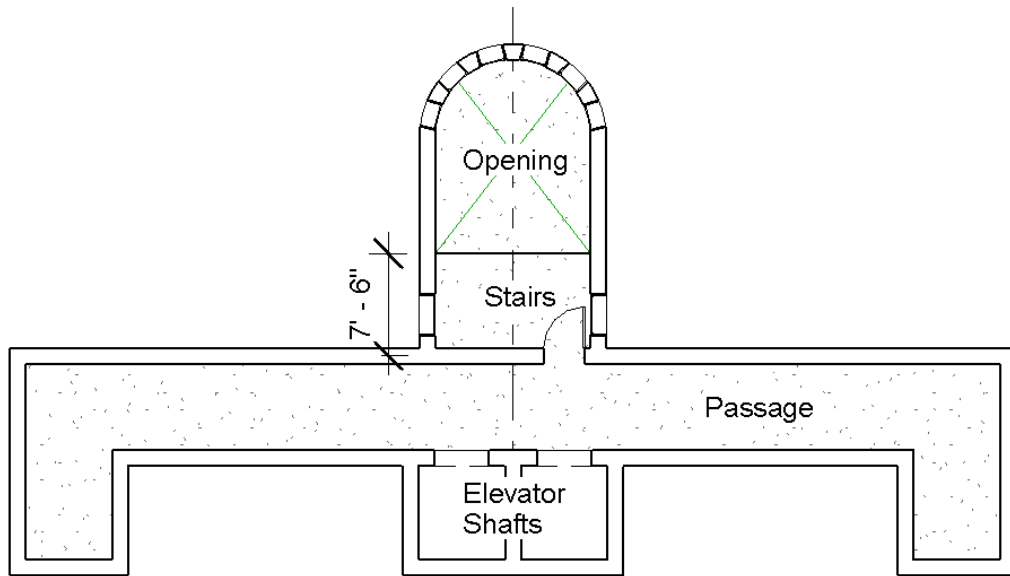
Sketch plan for creating an opening for the Elevator and Stair Lobby project
